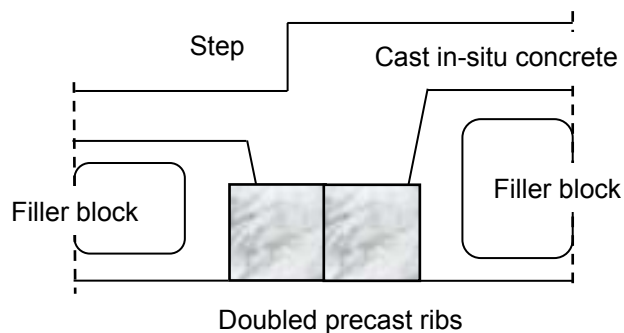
Step at the top of a beam and block slab system (parallel to ribs)
